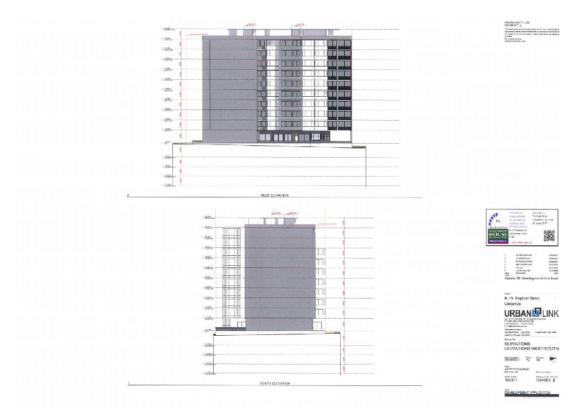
The approved west and south elevations showing the blank elevations to laneway and adjoining.
